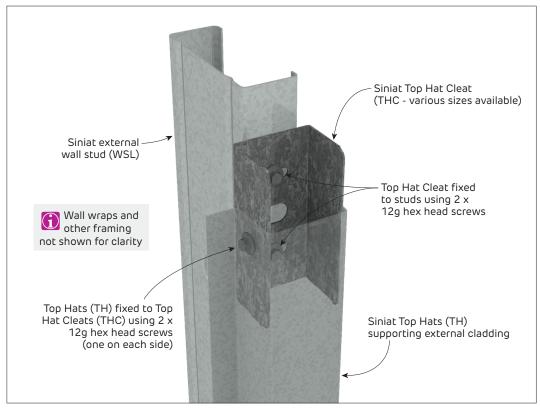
Top Hat Cleat over External Steel Stud Wall
